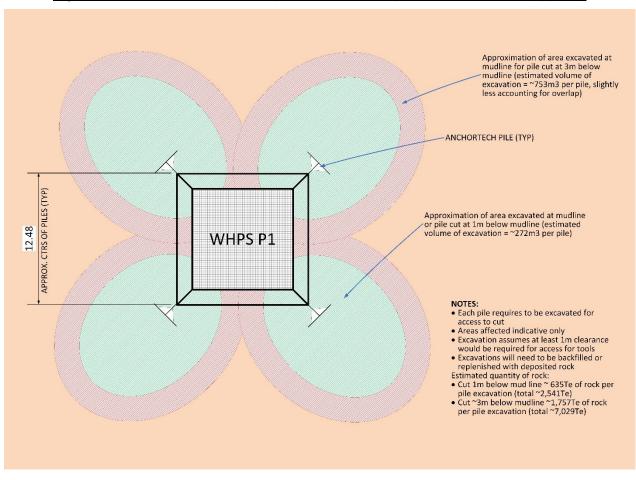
WHPS P1 indicative pile excavation requirements, plan view
